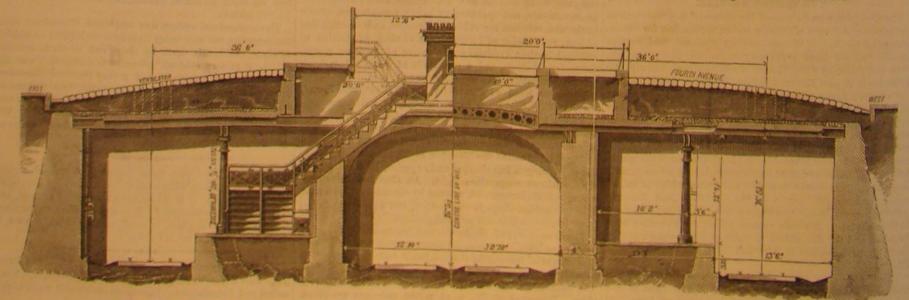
THE UNDERGROUND RAIL VAY NEW YORK CITY-THE 86th STREET PASSENGER STATION.
